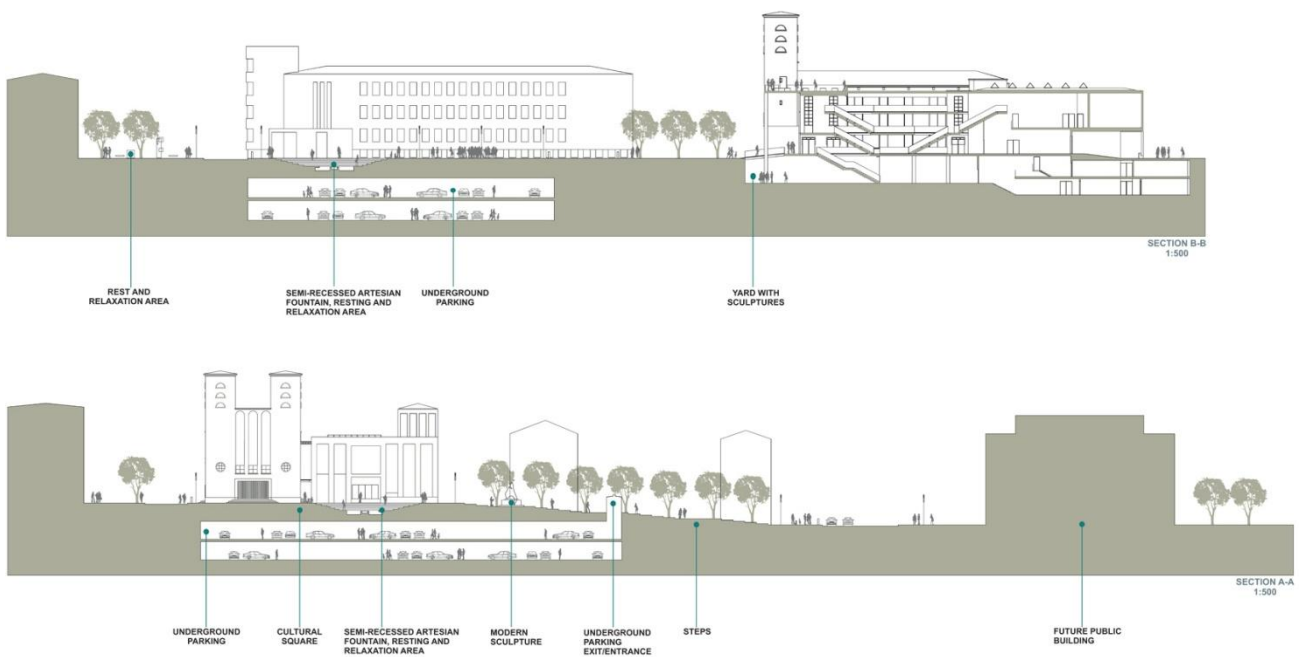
Cross Sections - Vabaduse Square and the new Arvo Part Hall.
